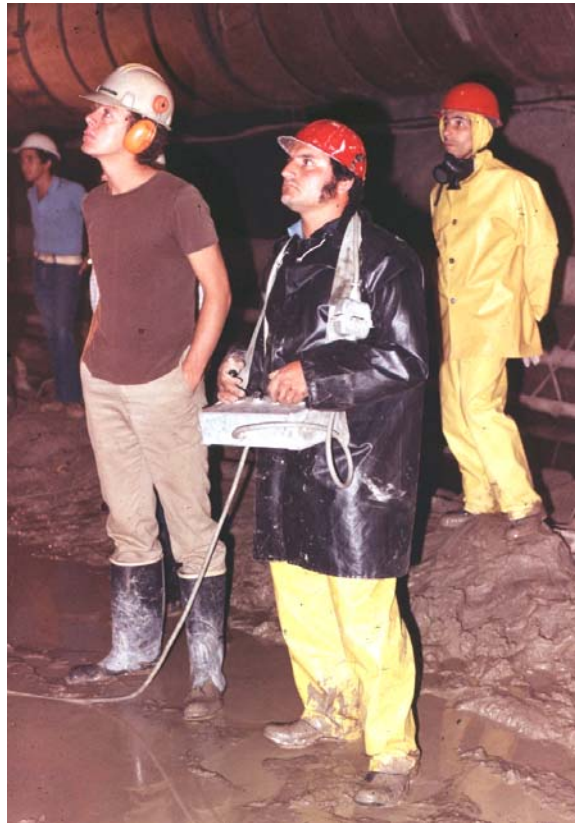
Shotcrete operator using a remotely controlled unit to apply shotcrete to a rock face in a large civil engineering excavation.
